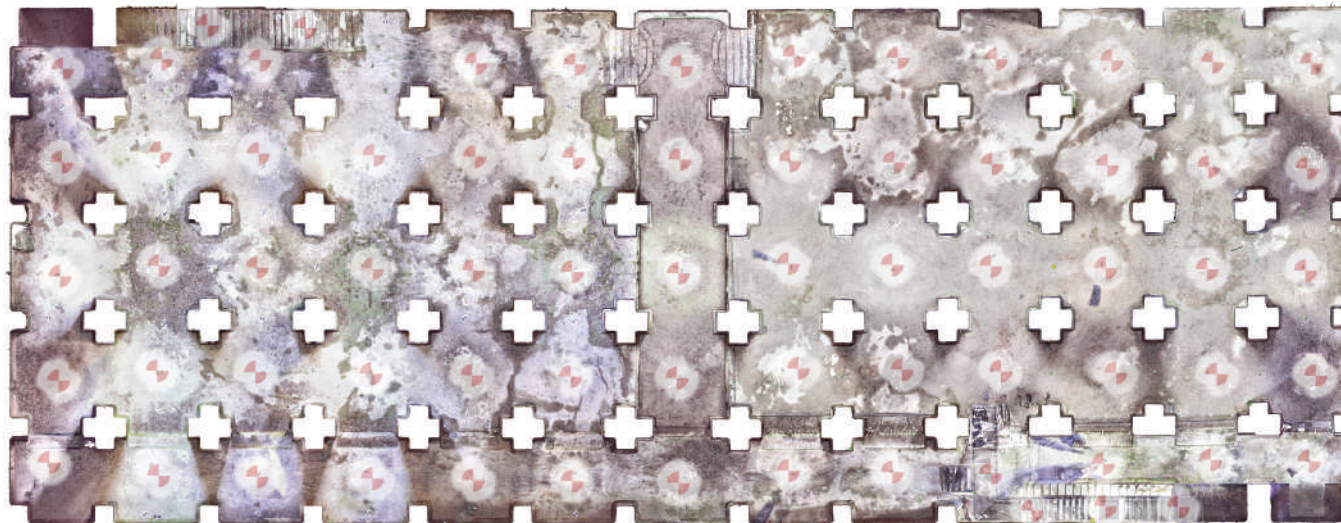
Floor plan extracted from the point cloud processed, with the interior TLS stations.
